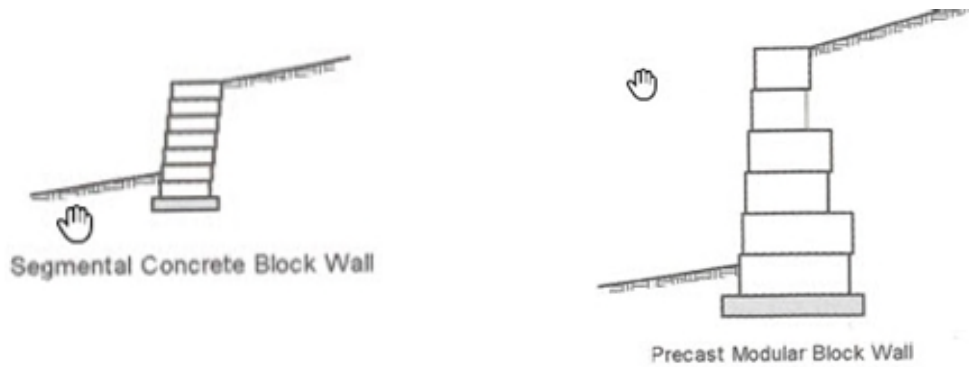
Gravity – Precast Segmental and Modular Block Walls (AASHTO LRFD, November 2017)
